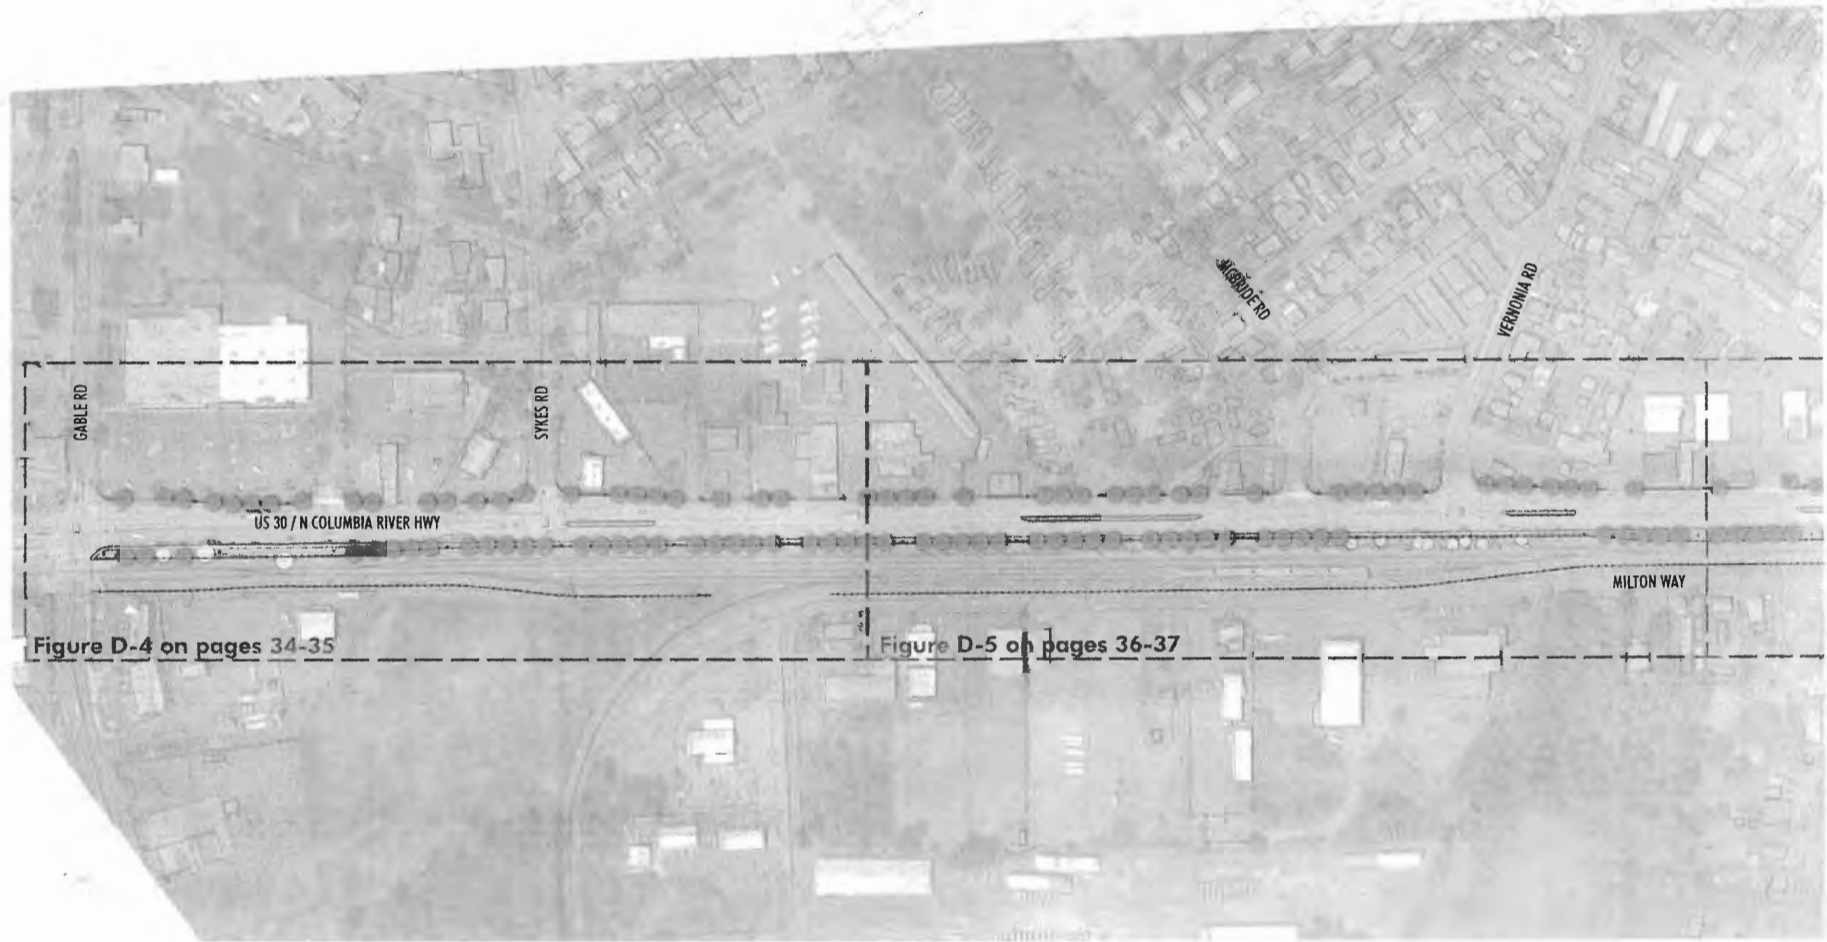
US 30 Corridor Segment - Proposed Improvements and Plan Keymap
